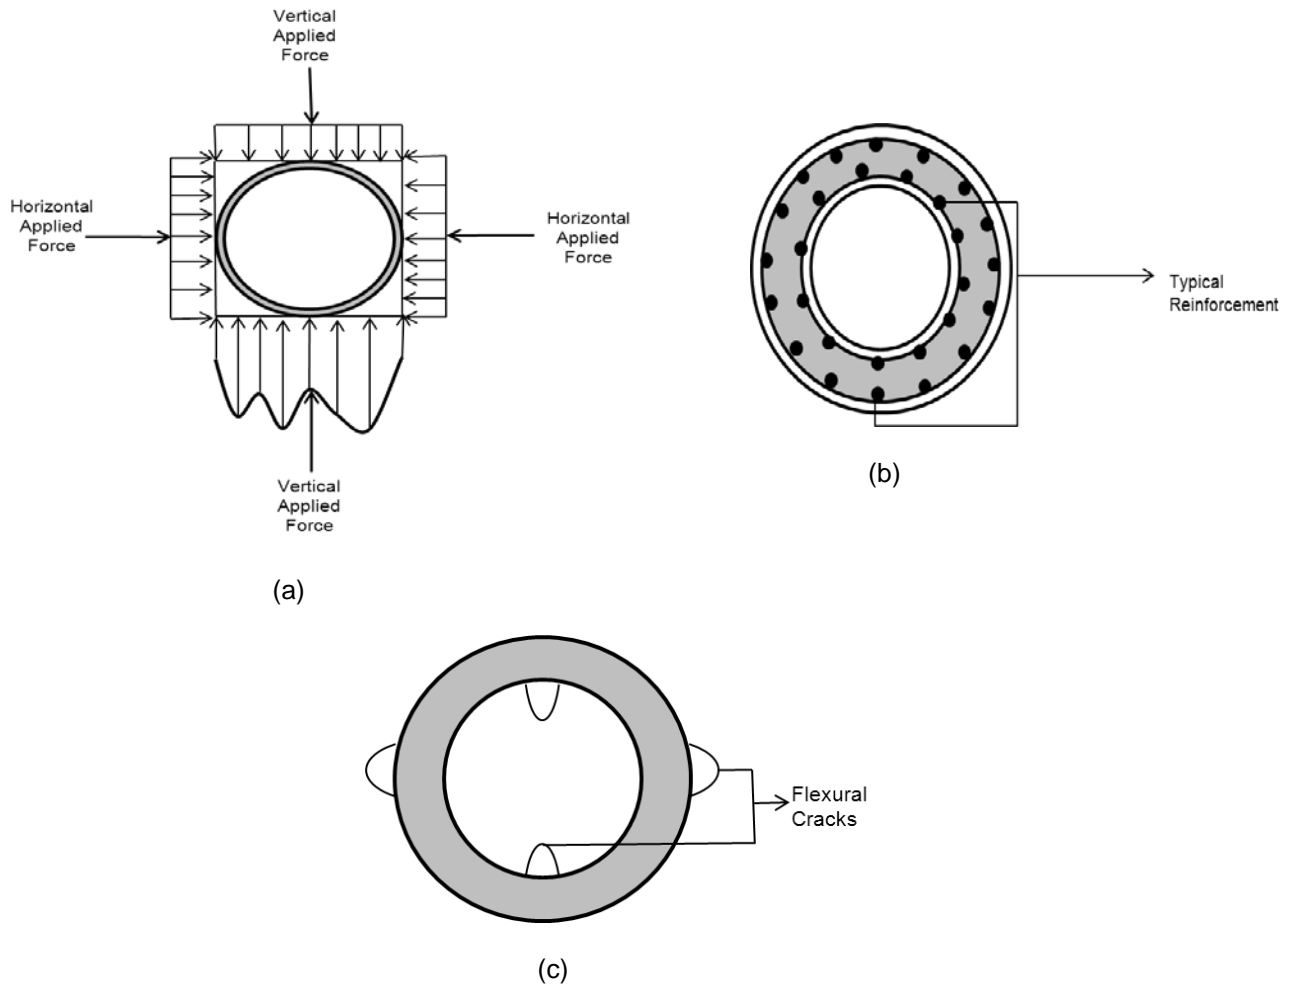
Concrete pipe applied loads: (a) vertical and horizontal loads; (b) Reinforcement system; and (c) flexural cracks
